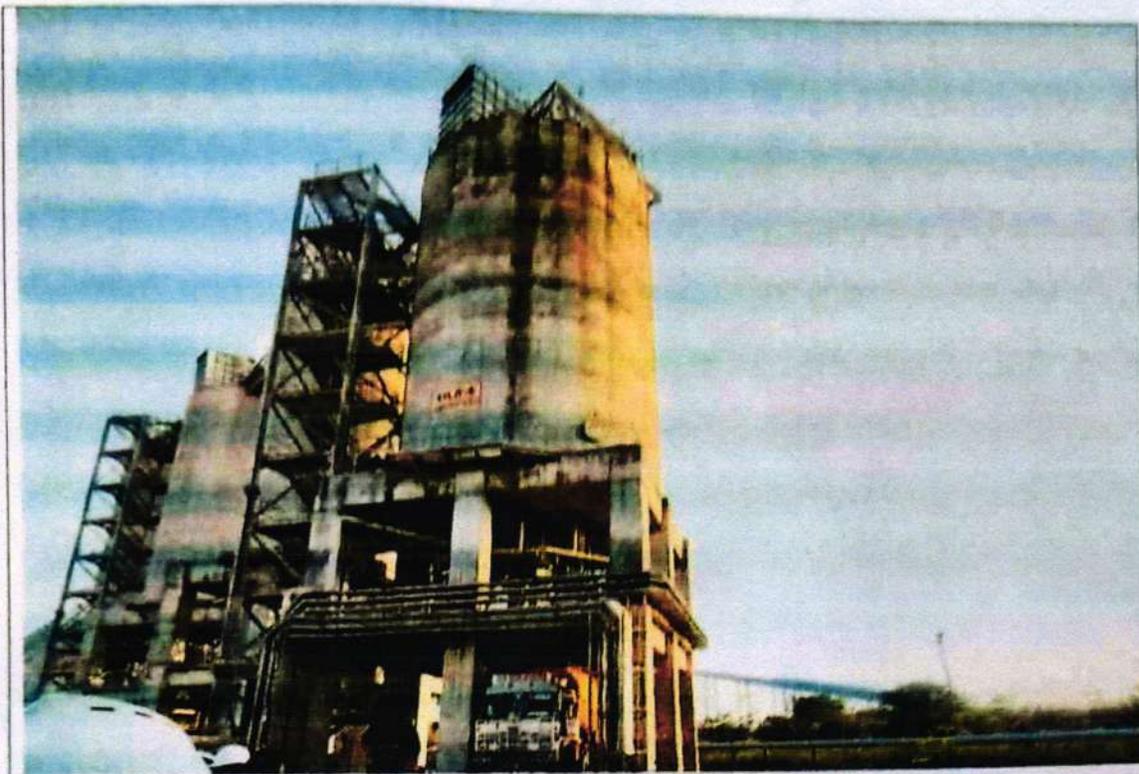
View of ash silos (dry fly ash collection and loading system)
